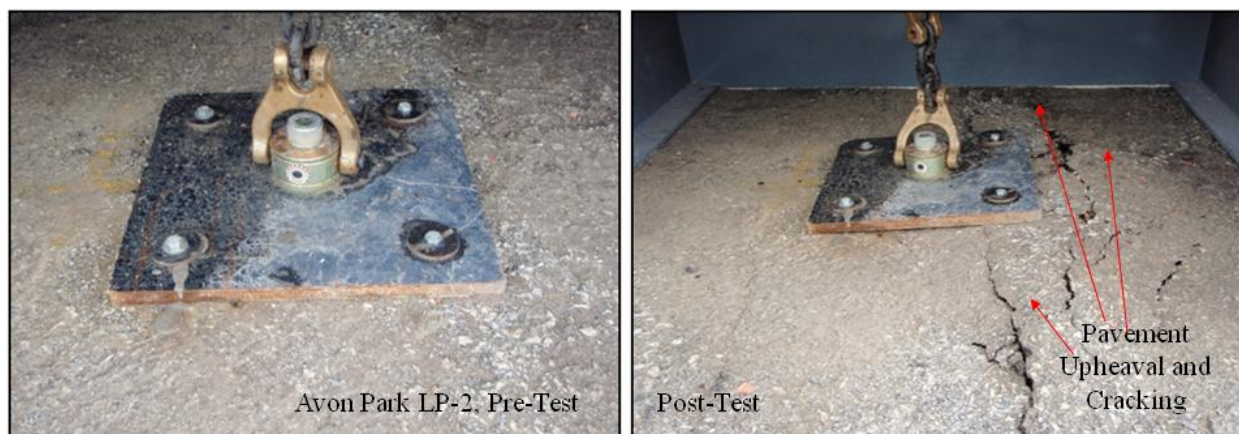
Avon Park LP-2, Post-Test Pavement Damage
